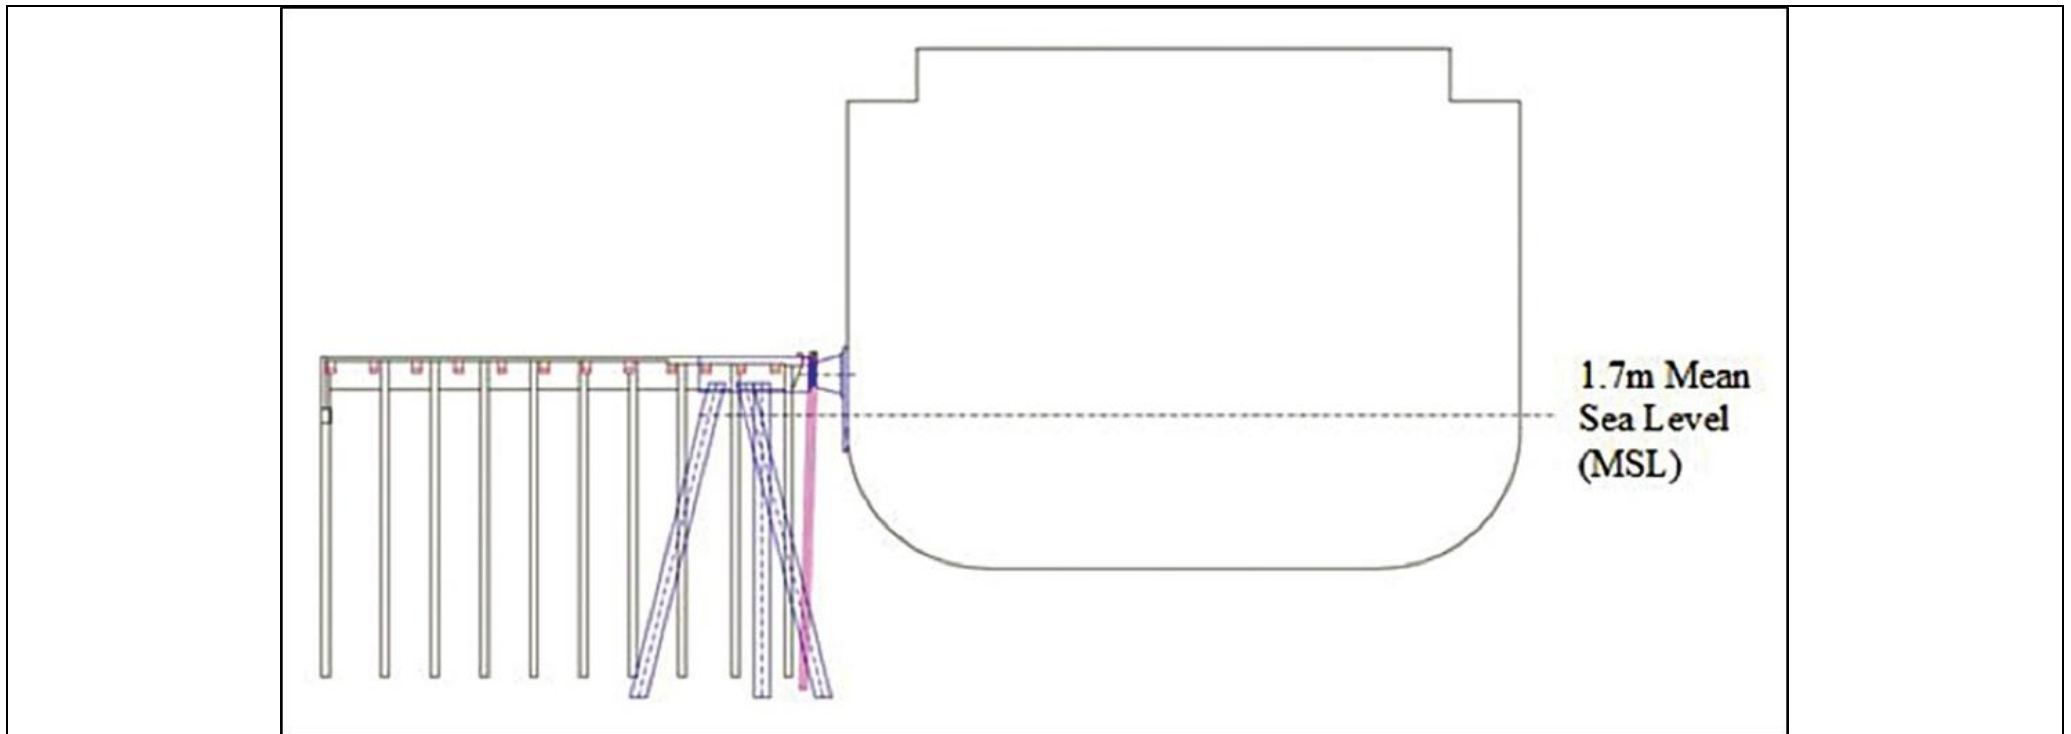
Typical section showing berthing structure and berthed design vessel.
